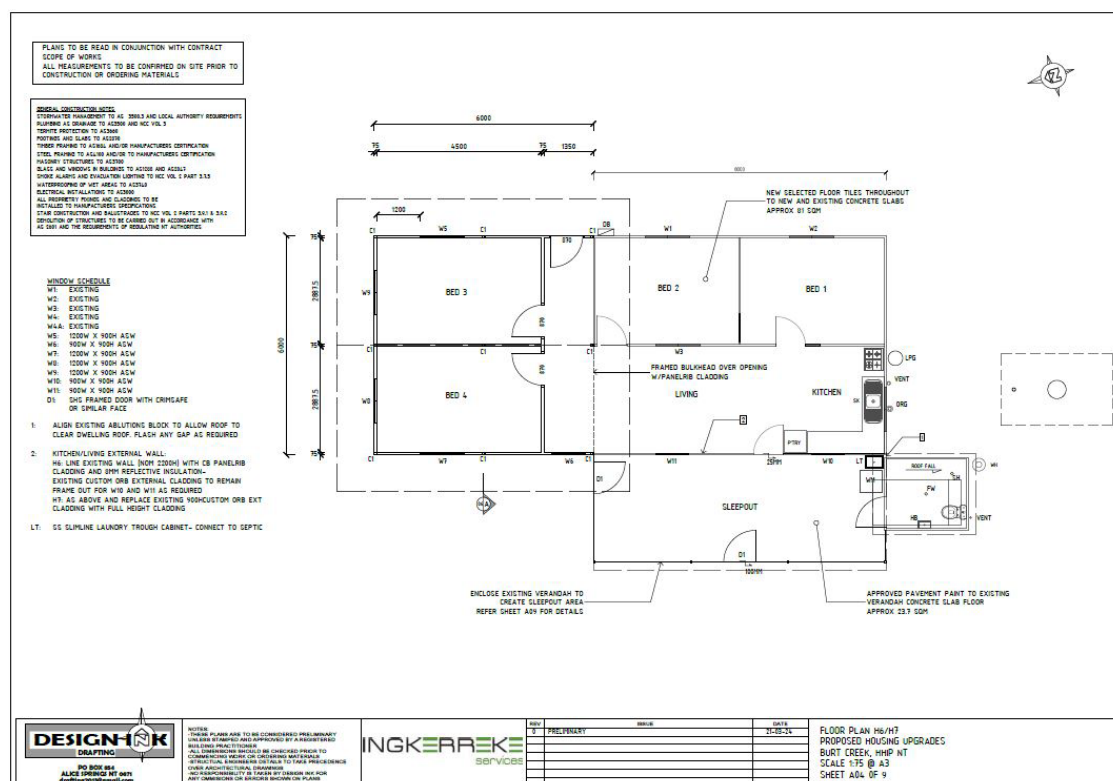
Burt Creek tin shed dwelling proposed floor plan after renovation
